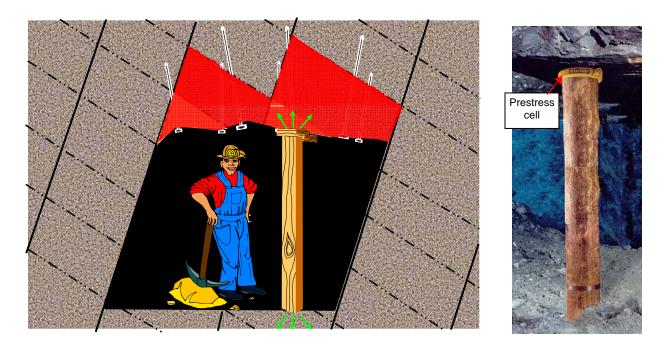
Water inflatable prestressing bladder used to preload a timber post and provide active roof loading to a traditionally passive support.
